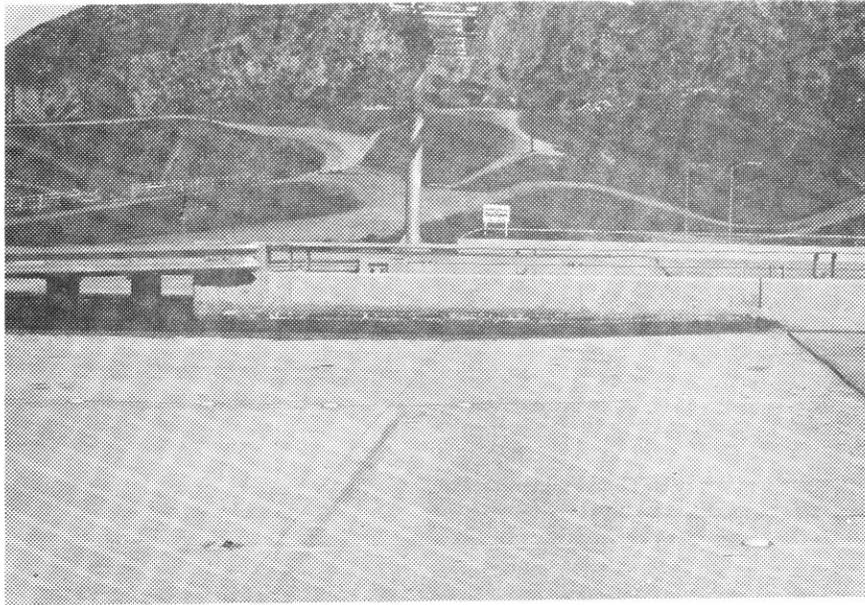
Fill and abutment backfill settlement at the Yarnell Street Undercrossing, eastbound roadway, west approach. Note ramp effect of approach slab to structure deck.
